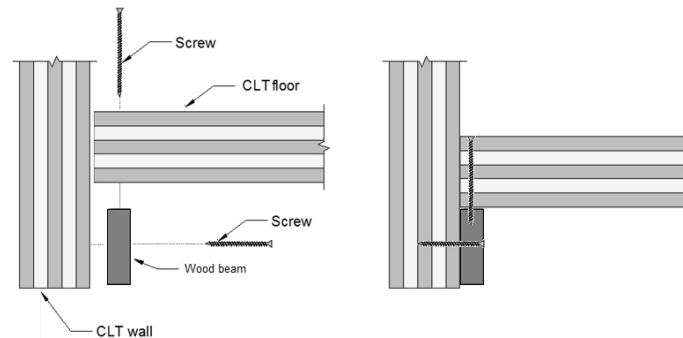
Connection between a wall and floor CLT panels with wood beam.
